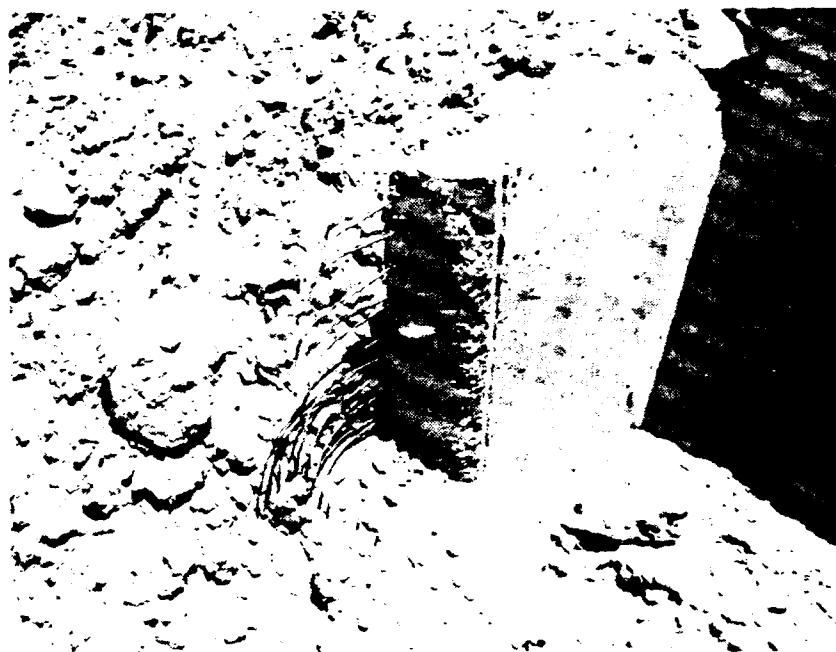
Exhaust port endwall failure at sidewall, PAS-3.
